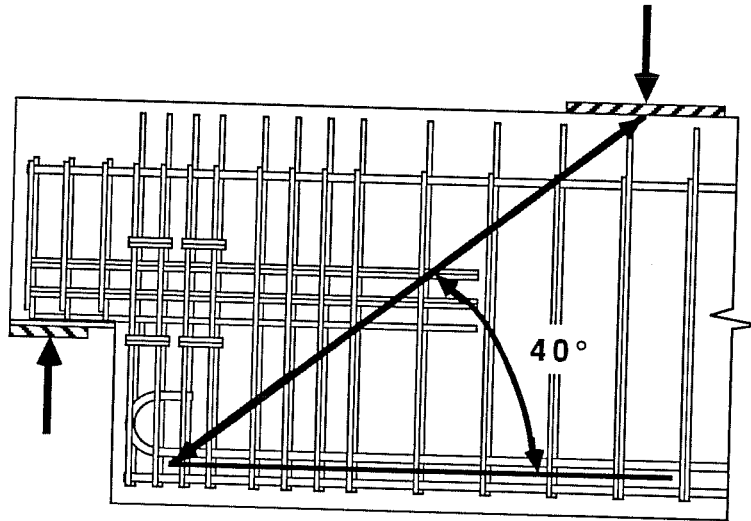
Compression Strut Intersecting CTT-Node in Prototype Beam Specimen
